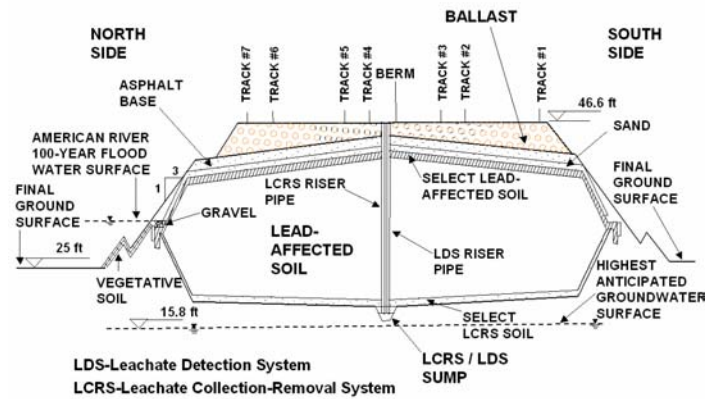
Cross section of proposed containment berm and flood protection levee showing environmental control systems, material types, liners, and relocated rail lines.
